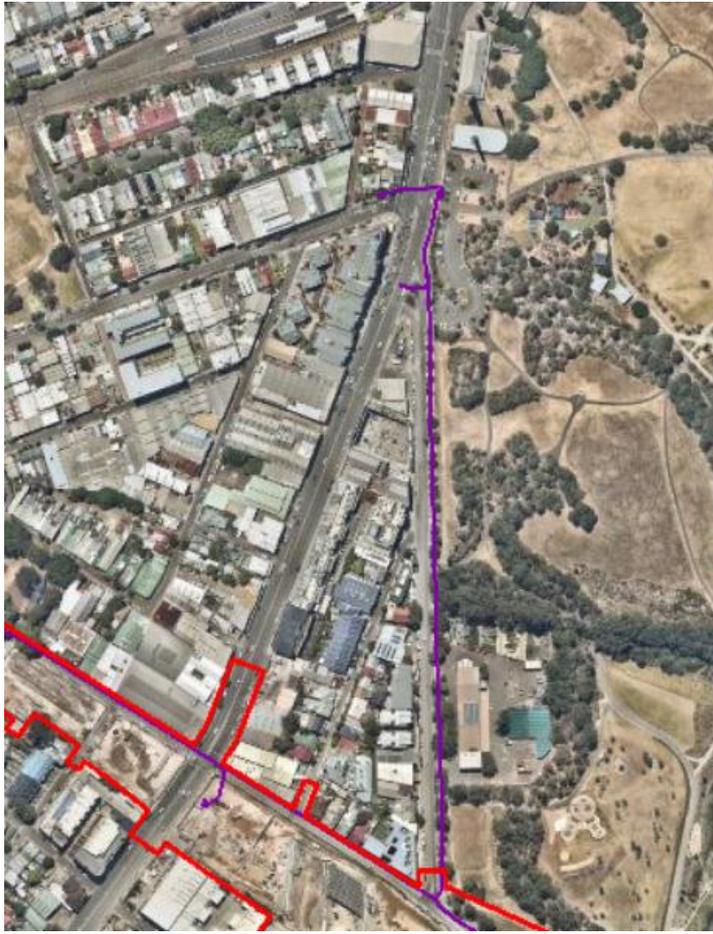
Location of ITS cabling works (purple line) to be installed at Barwon Park Road and Princes Highway. New M5 project boundary is shown in red.
